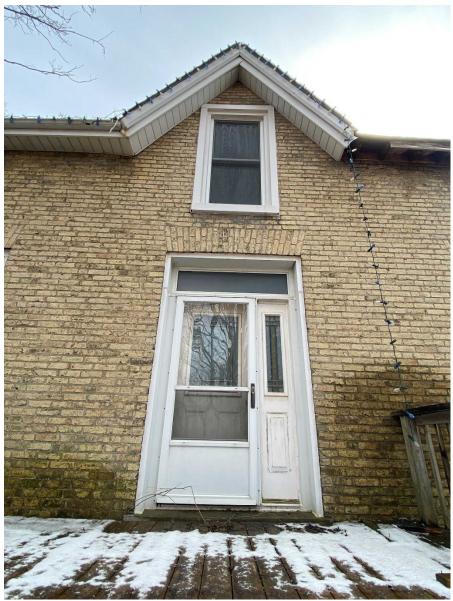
Photograph showing entrance door with sidelight and transom prior to being boarded up – north elevation (L.Dent, March 14, 2022).
